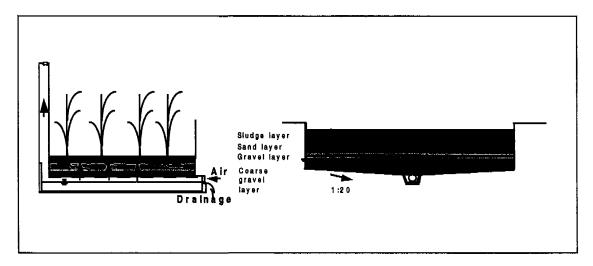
Planted and Unplanted Sludge Drying Beds (schematic)
